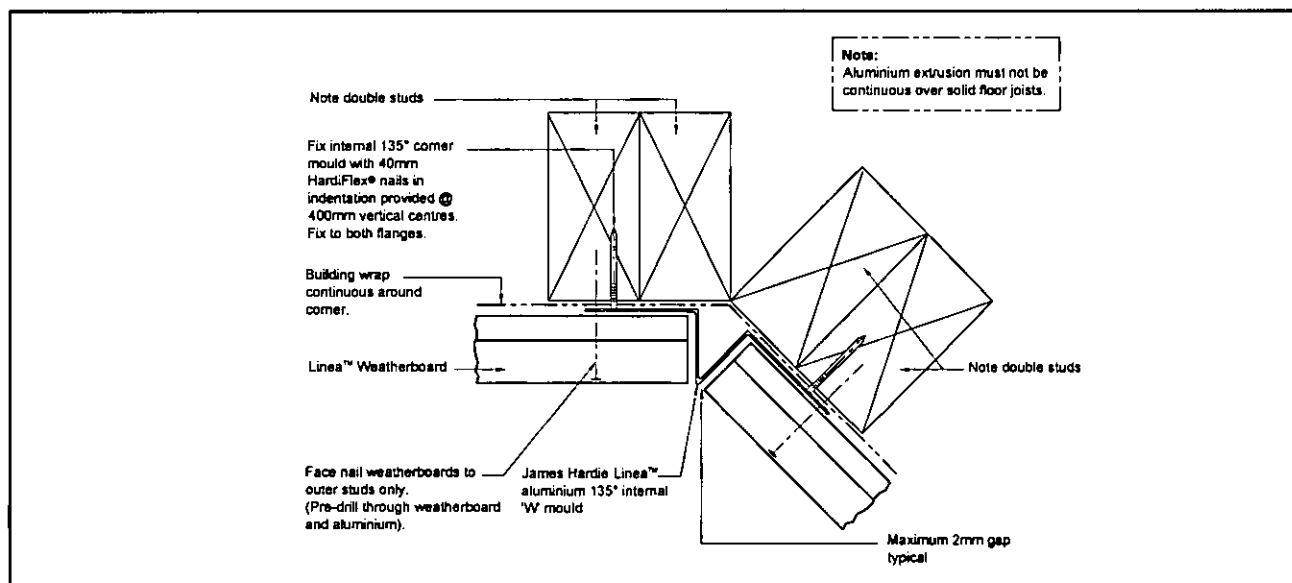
DIRECT FIX INTERNAL 135° ALUMINIUM 'W' MOULD CORNER
